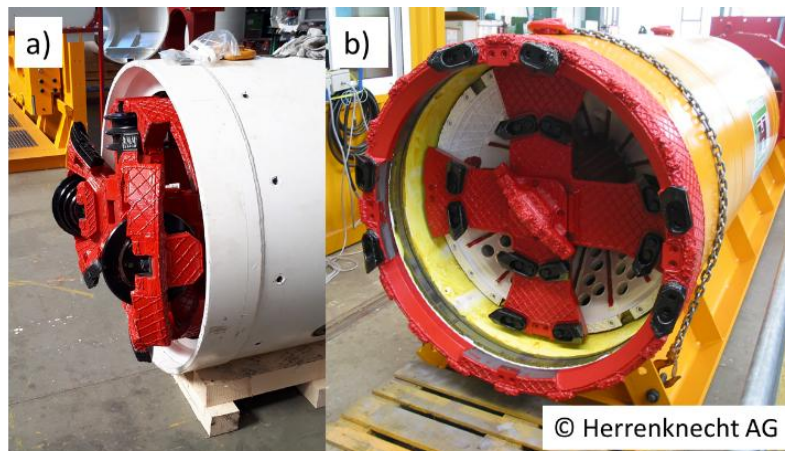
a) First option for the retraction mechanism of the M-TBM machine with a tiltable cutting head b) Second option for the retraction of the M-TBM machine with a lost outer head ring (Herrenknecht AG archive)
